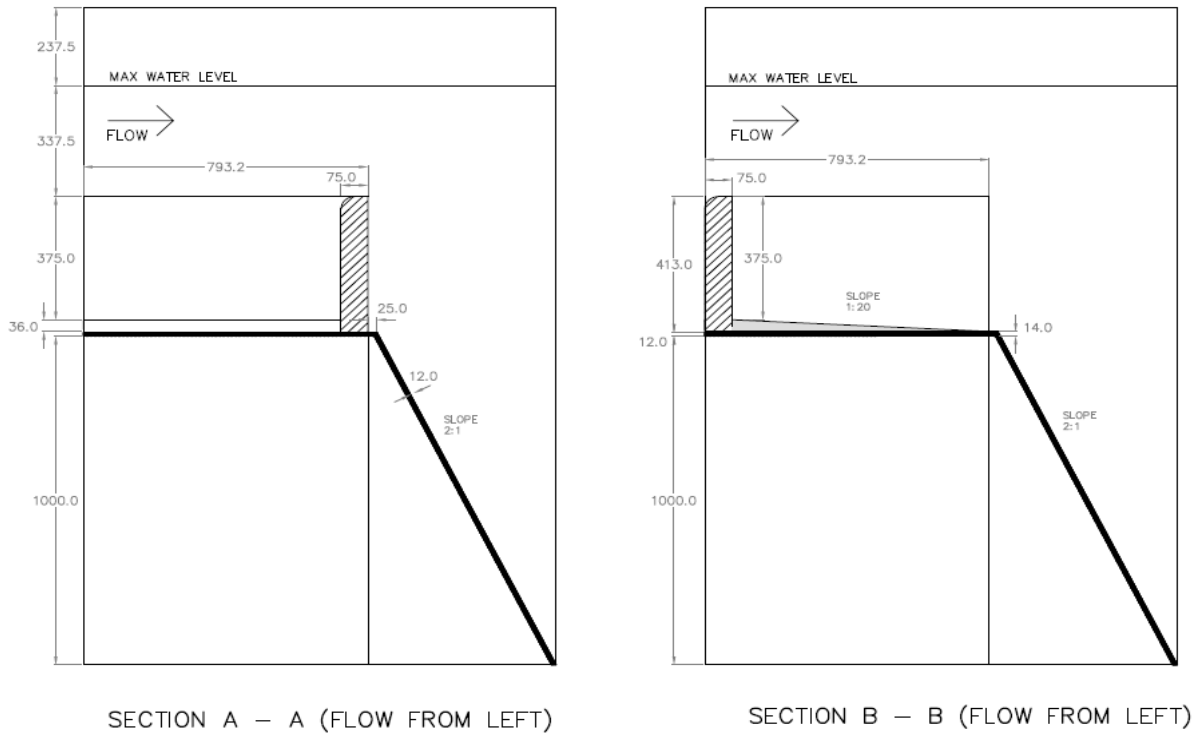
Section views through the labyrinth weir crest with dimensions at a scale of 1:20
